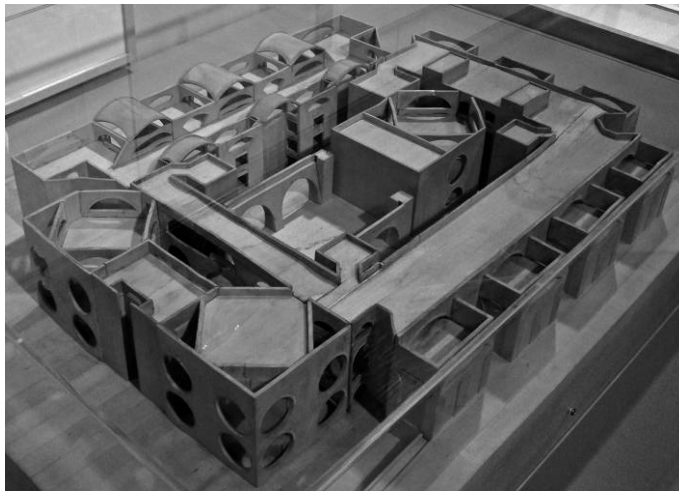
Model and drawing, Revised design for Main School Building, May 1965.
